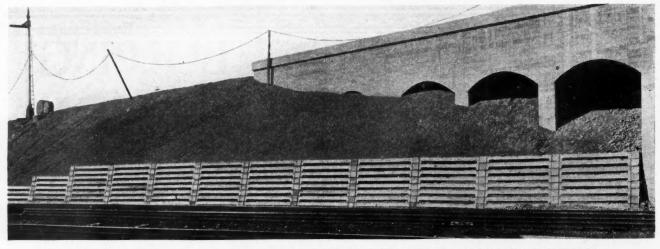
Concrete Cribbing Used as Retaining Wall Along Belt Line Railway, Near Seventy-ninth Street, South Chicago.
